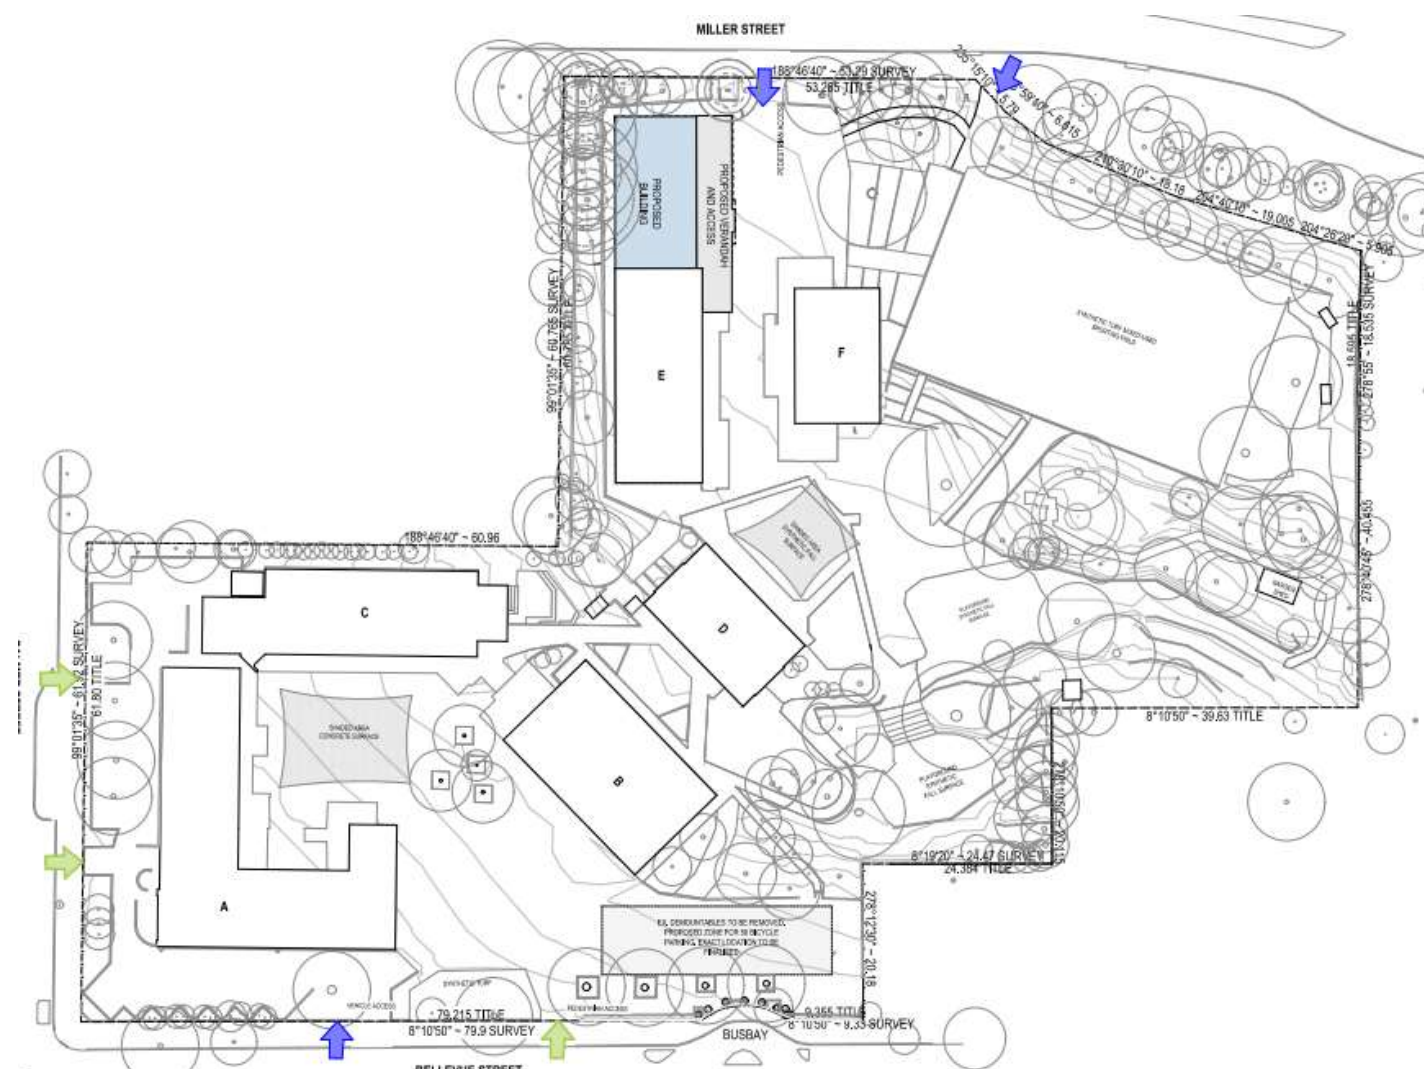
Proposed Scope of Works (Source: Fulton Trotter Architects, Proposed Site Plan (Rev P5))
